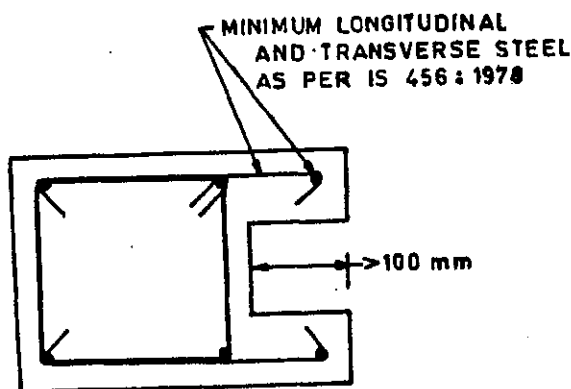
REINFORCEMENT REQUIREMENT FOR COLUMN WITH MORE THAN 100 mm PROJECTION BEYOND CORE
